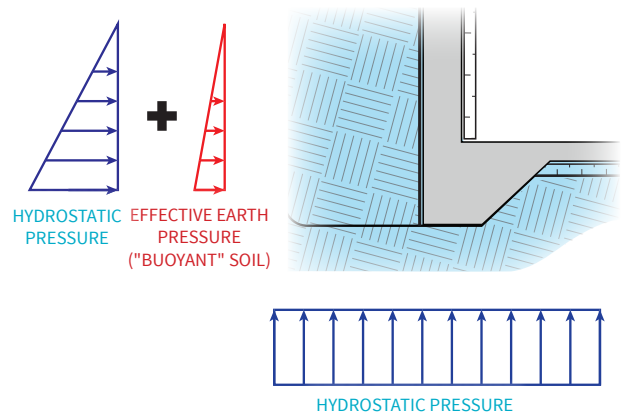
Submerged foundation below the water table. Foundation/slab is tanked; no drain pipe required.
